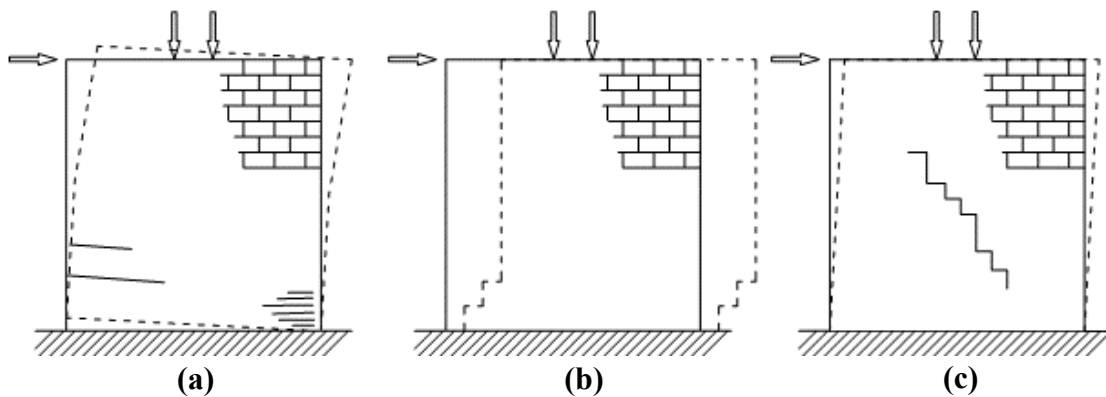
Reinforced masonry shear wall failure modes: (a) flexural; (b) sliding, (c) shear (adapted from Voon 2007)
